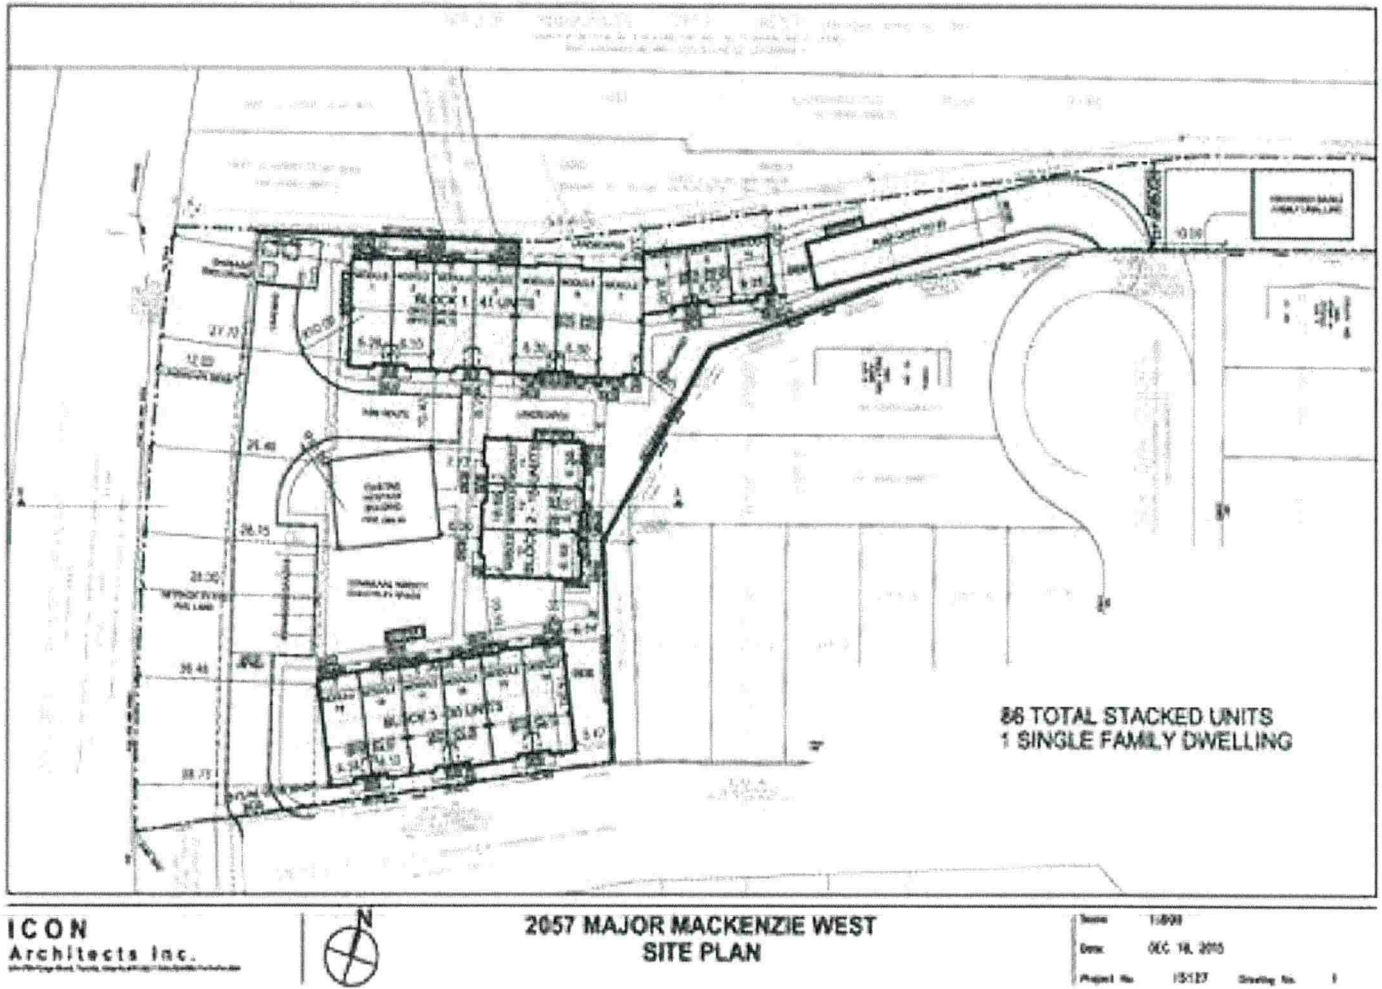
Site plan showing the proposed development surrounding Joshua Oliver House.
